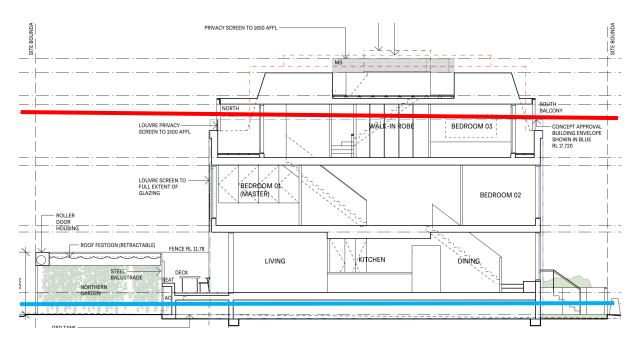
A section plan with the maximum nine metre height of building development standard shown in red and the flood planning level shown in blue.
